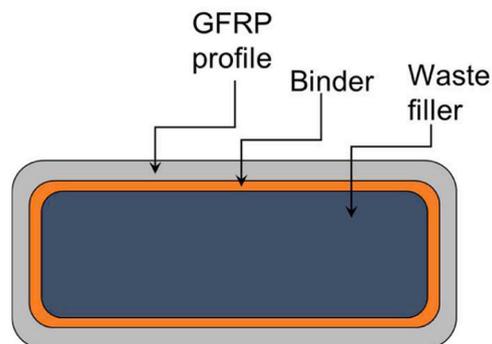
Concept of cement grout as a binder between GFRP profile and waste filler for railway sleeper.
